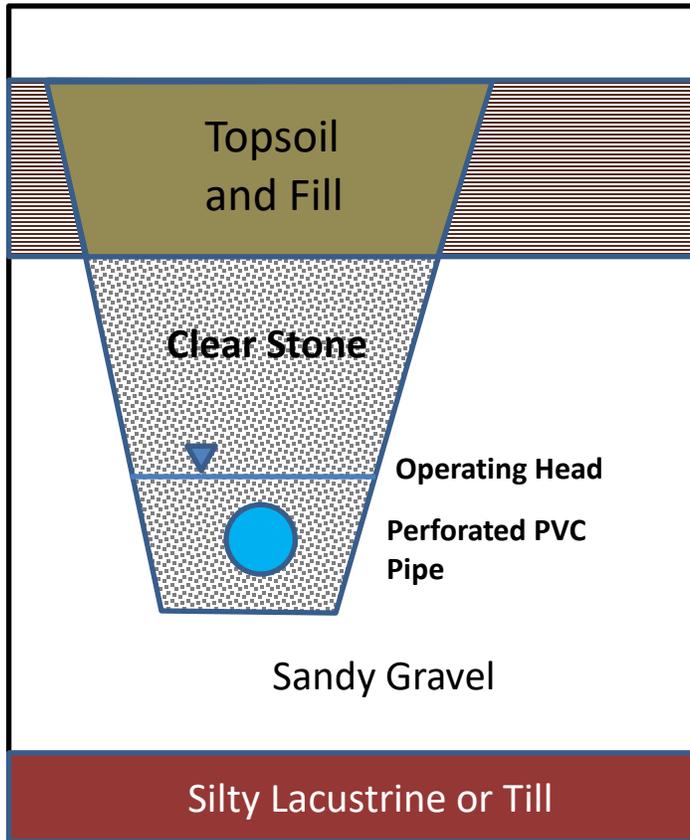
Groundwater Cut-Off Wall Plan and Section
